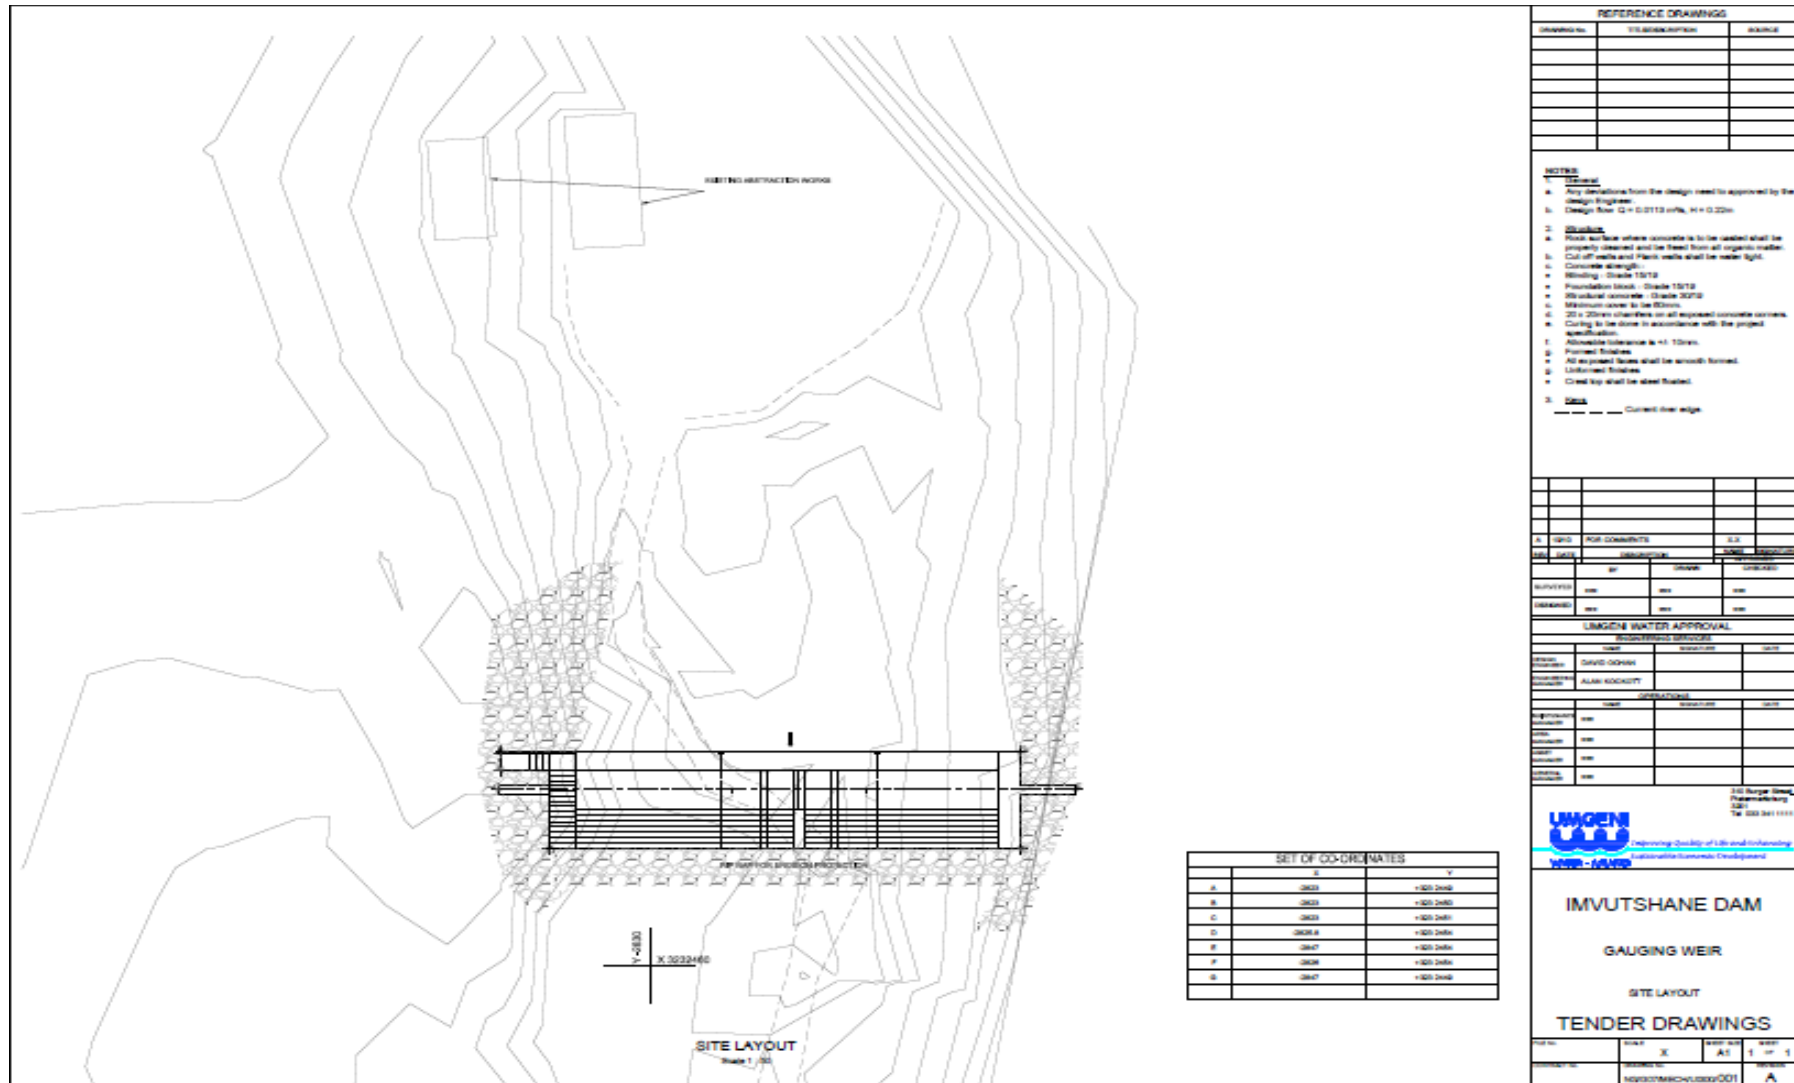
Imvutshane Dam – Gauging Weir Site Layout
